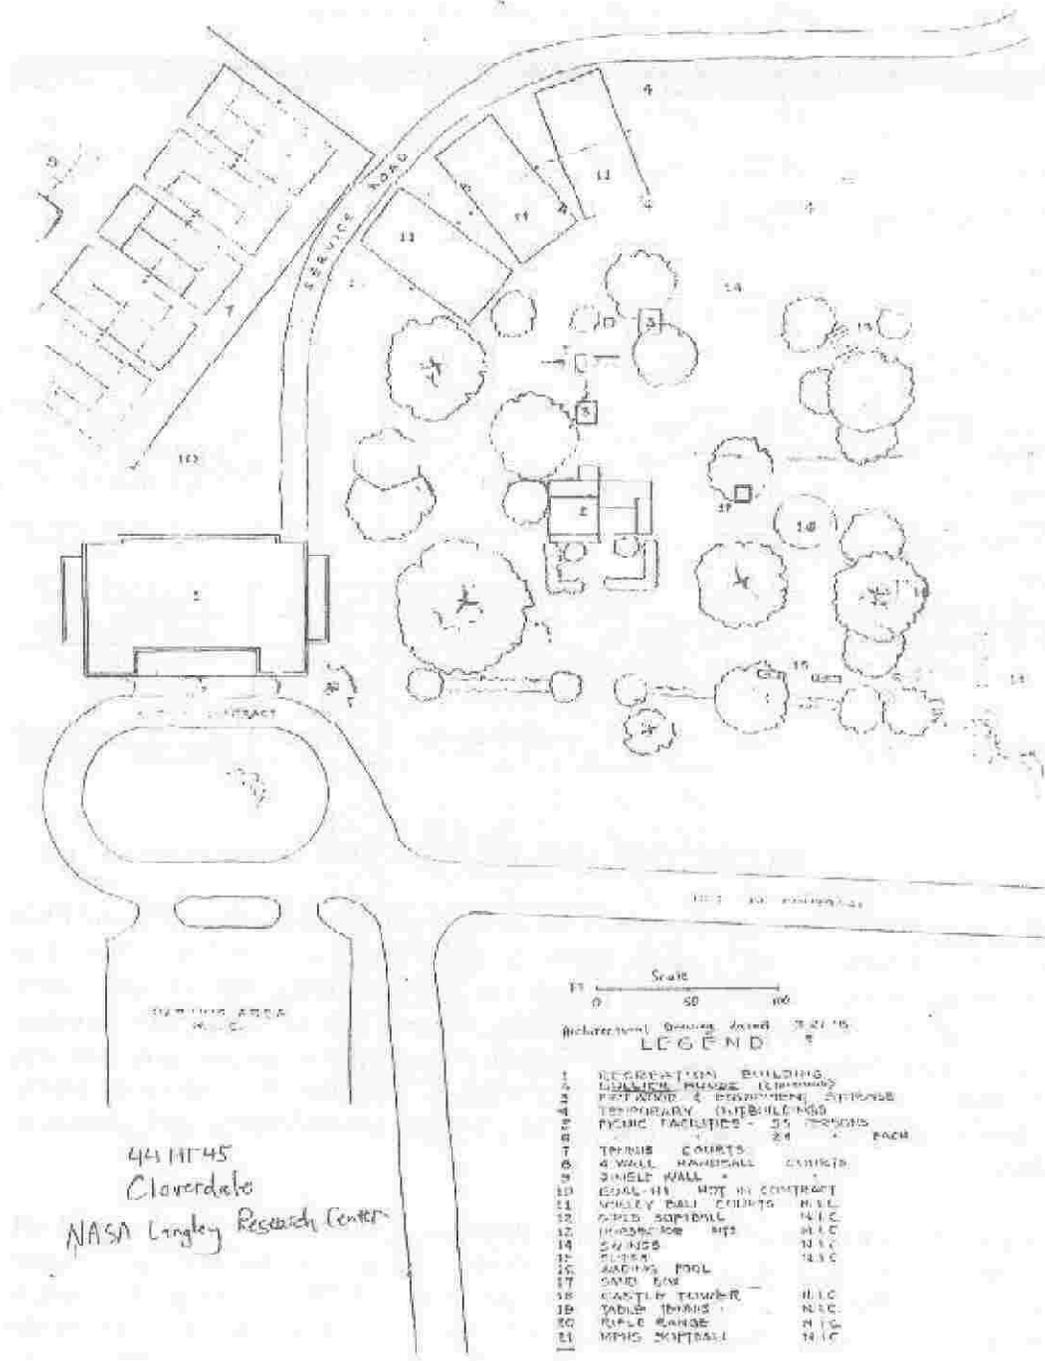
Plan of the Cloverdale Site drawn Dr. Frank Farmer, 1945.
